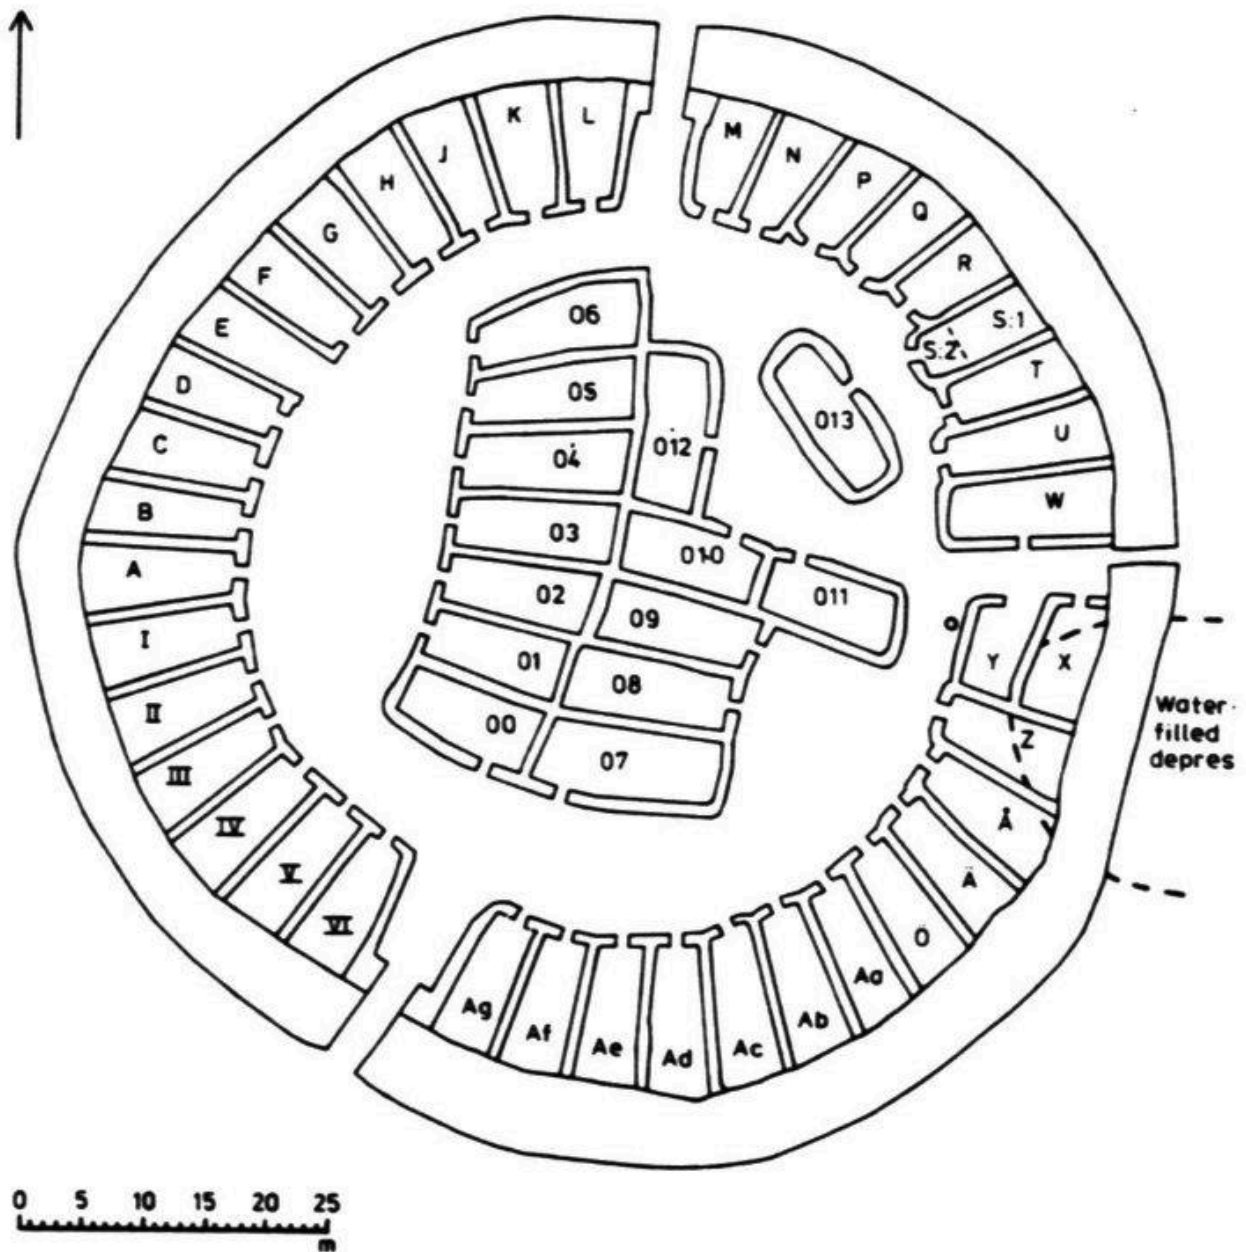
PLAN OF THE EKETORP-II SETTLEMENT FORT. THE RECONSTRUCTED HOUSES ARE CROSS-HATCHED (AFTER BORG ET AL. 1976)
